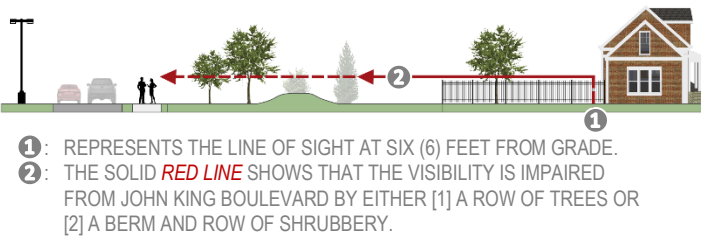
DESIGN ALTERNATIVE #5; EYEBROW STREET
